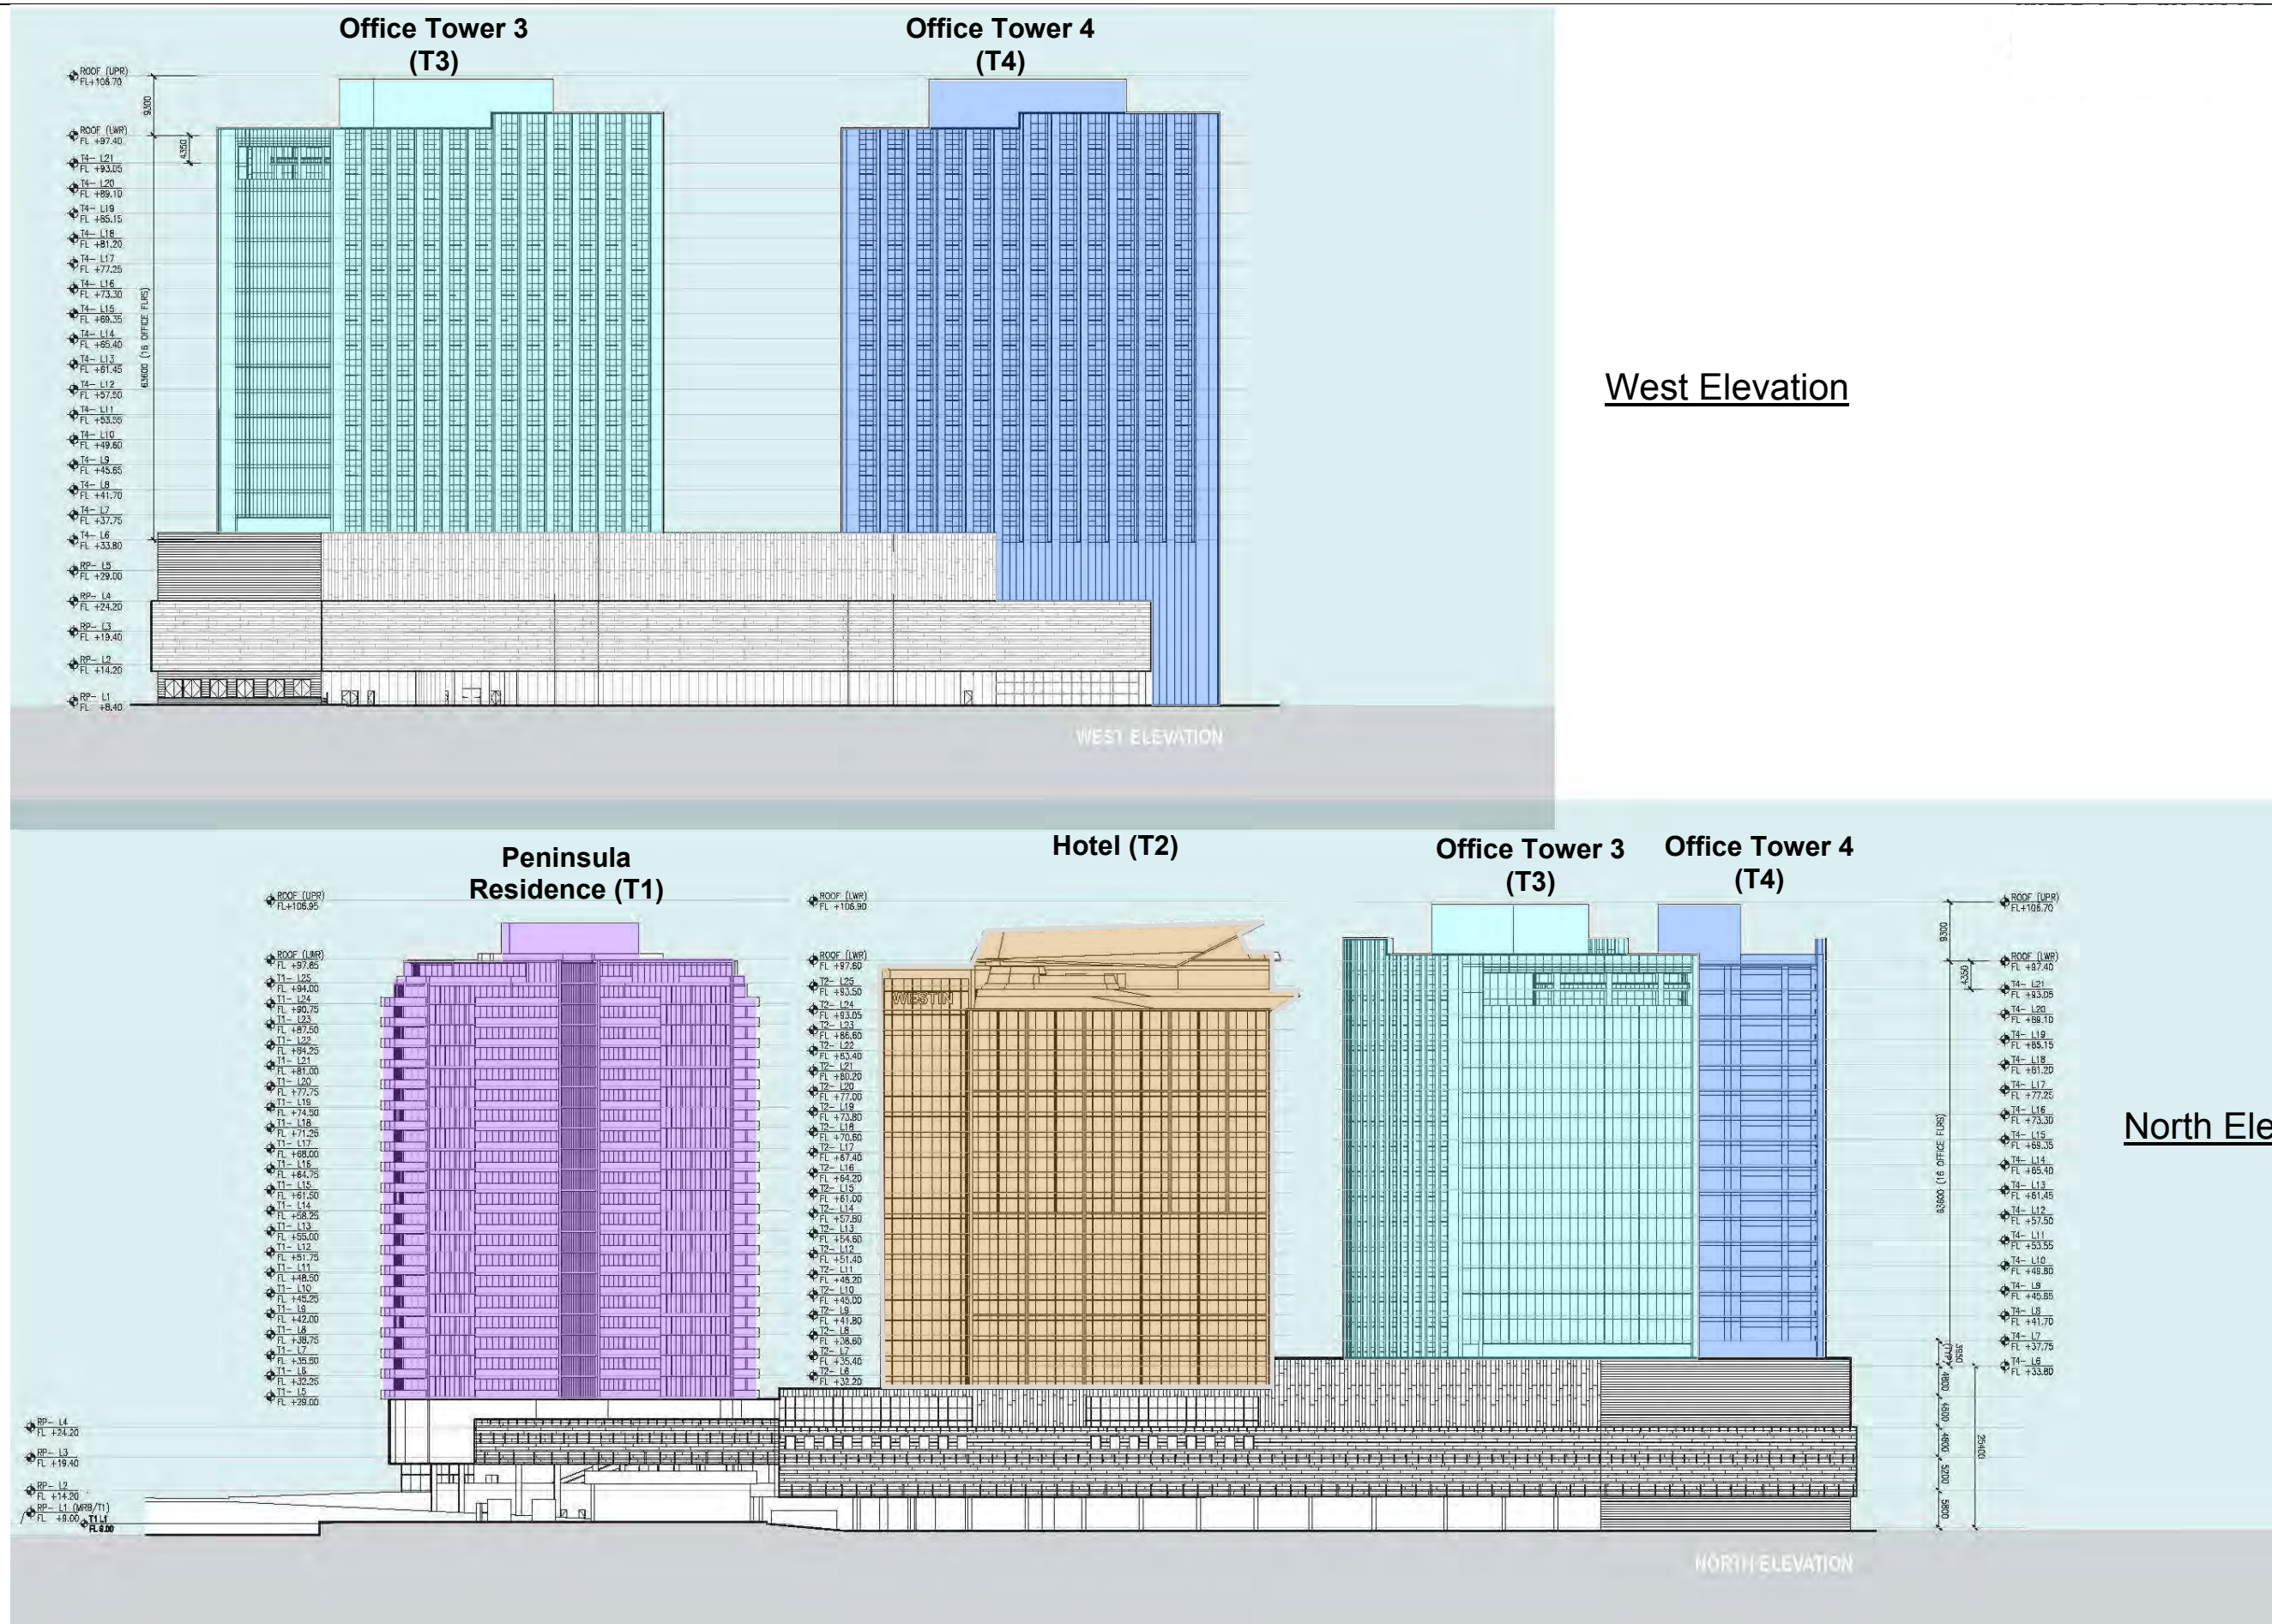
Sectional Elevation View of Proposed Project (West and North)
